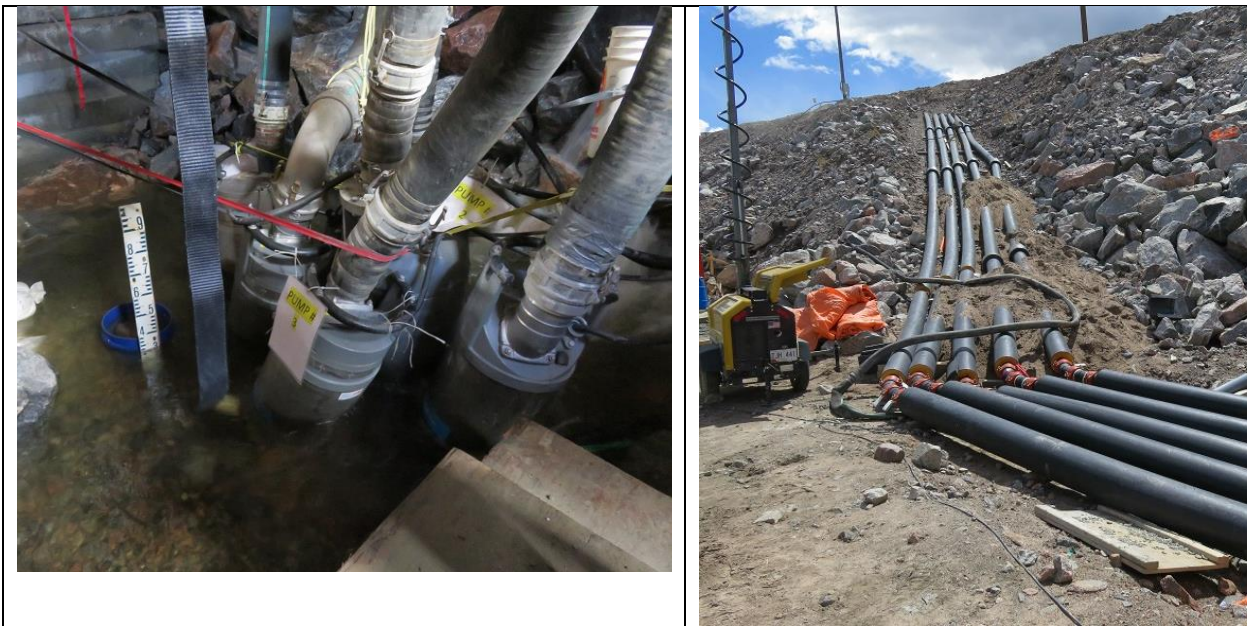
Pumps and piping for upstream cofferdam dewatering system. Water is being pumped back to the reservoir.
